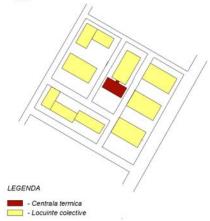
Example of central heating plant location in the quadrant of collective dwellings c. Central heating plant – totally linked to a building block on one side - the initial project.
